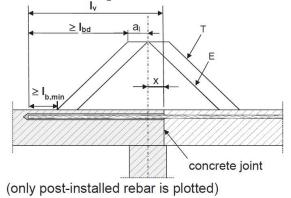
Overlap joint at a foundation of a column or wall where the rebars are stressed in tension
